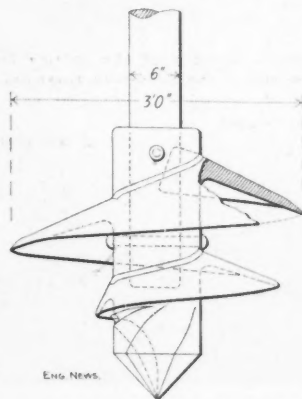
Screw Piles for Foundations of Telescopic Draw Bridge Over River Dee, at Queensferry, England.
